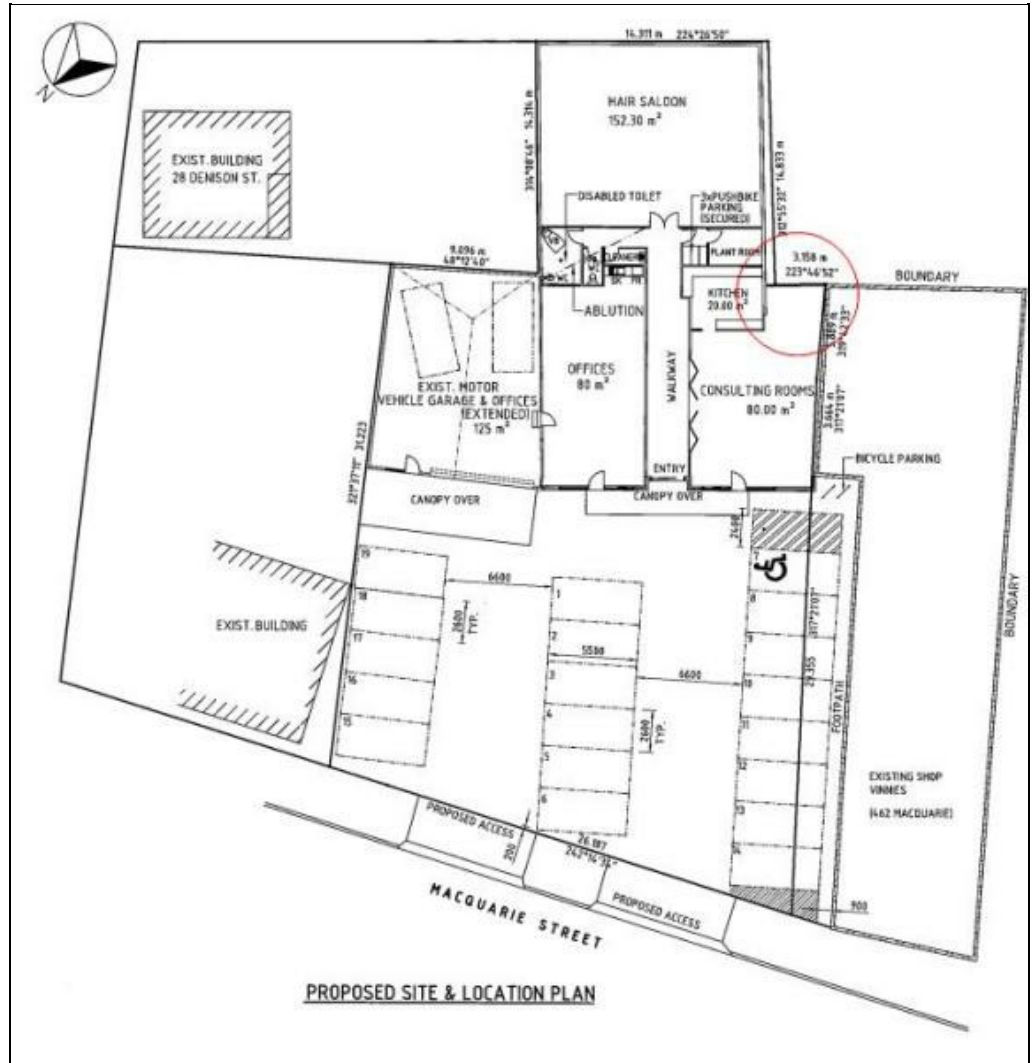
Showing the location of the building envelope discretion adjacent to 55 Darcy Street.
